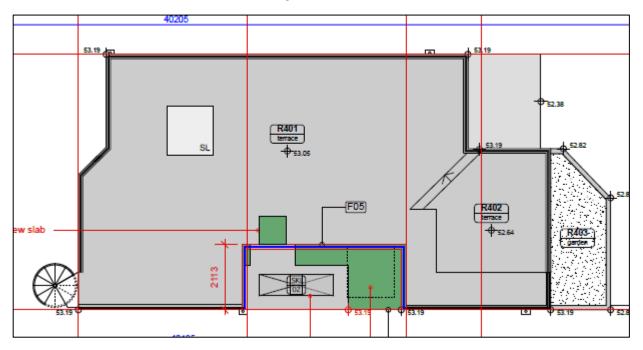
Area of roof terrace approved under DA-179/2023. (Source: Dowse Architecture, 2024)
